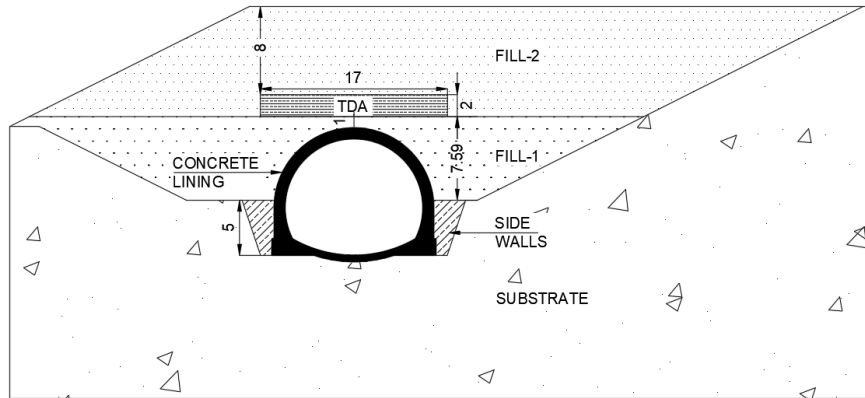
Cross-section view of the cut-and-cover tunnel at 82m, revealing tunnel geometry, TDA, and filling materials with dimensions
